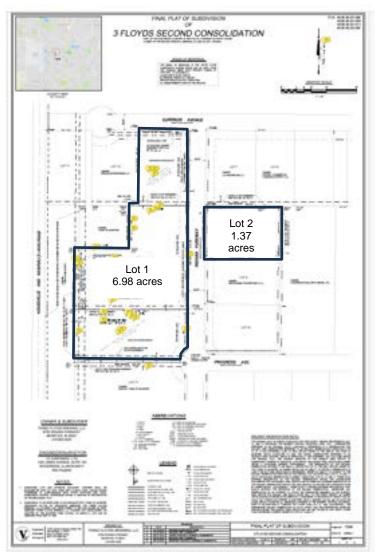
Proposed Final Subdivision Plat of 3 FLOYDS SECOND CONSOLIDATION
